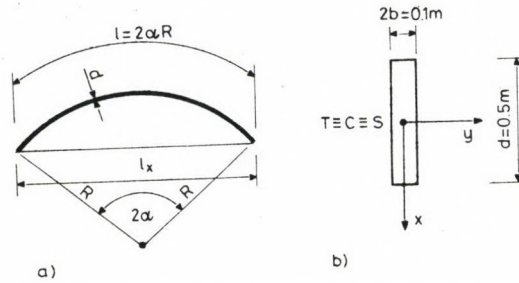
The arch of the numerical example, a) elevation; b) cross section
